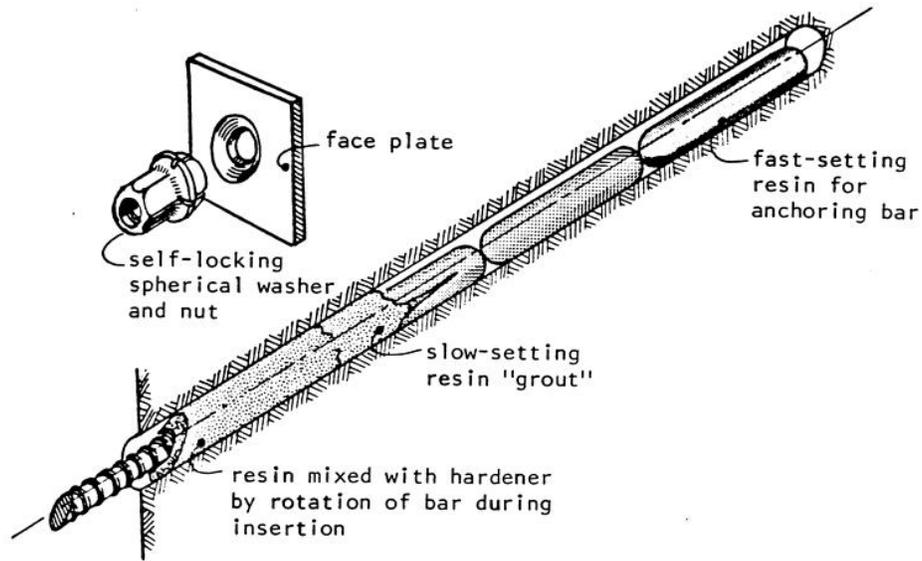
Resin anchored and grouted rockbolt system which allows very rapid installation and tensioning of the bolt.
